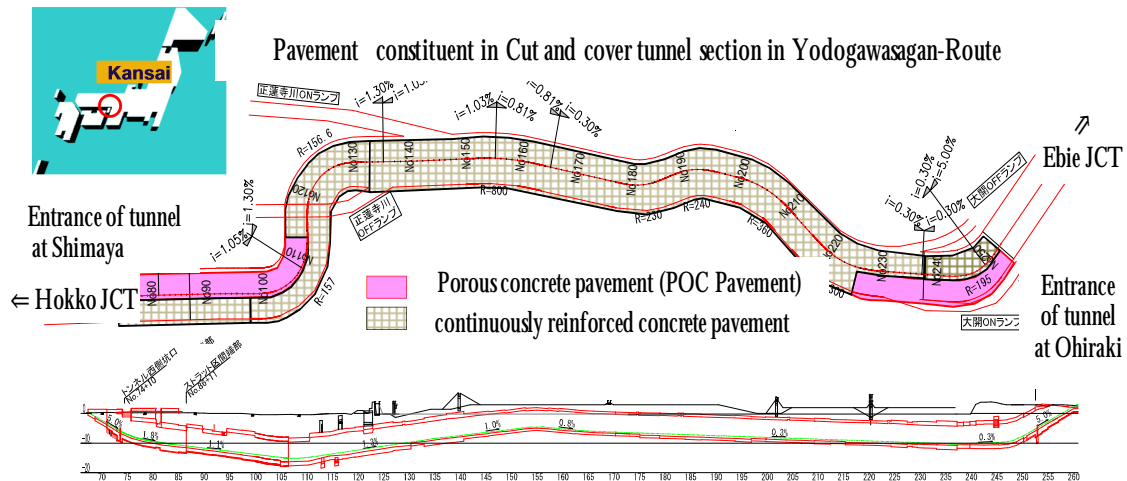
Pavement structures in cut and cover tunnel section in Yodogawasagan-Route
